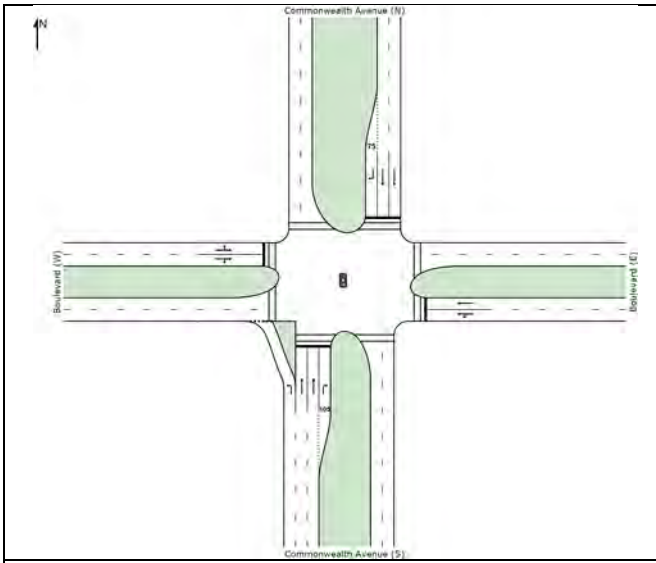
Variant 2c Parkes Way Boulevard – Commonwealth Avenue Intersection
